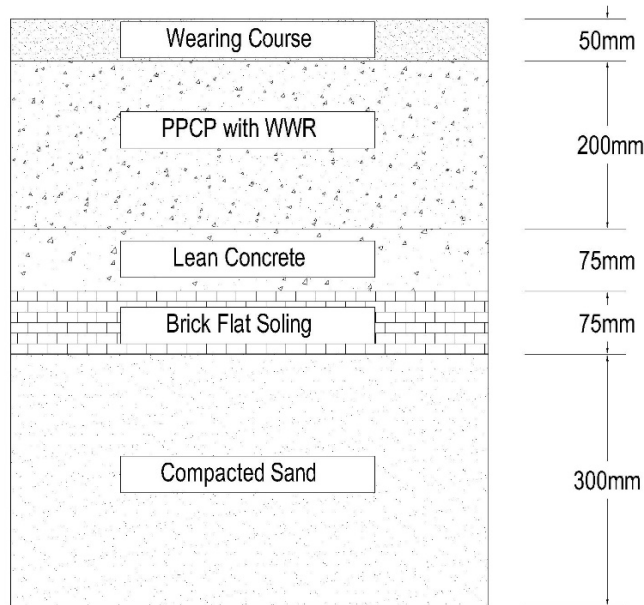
Cross-sectional profile of proposed pavement of PPCP with WWR
